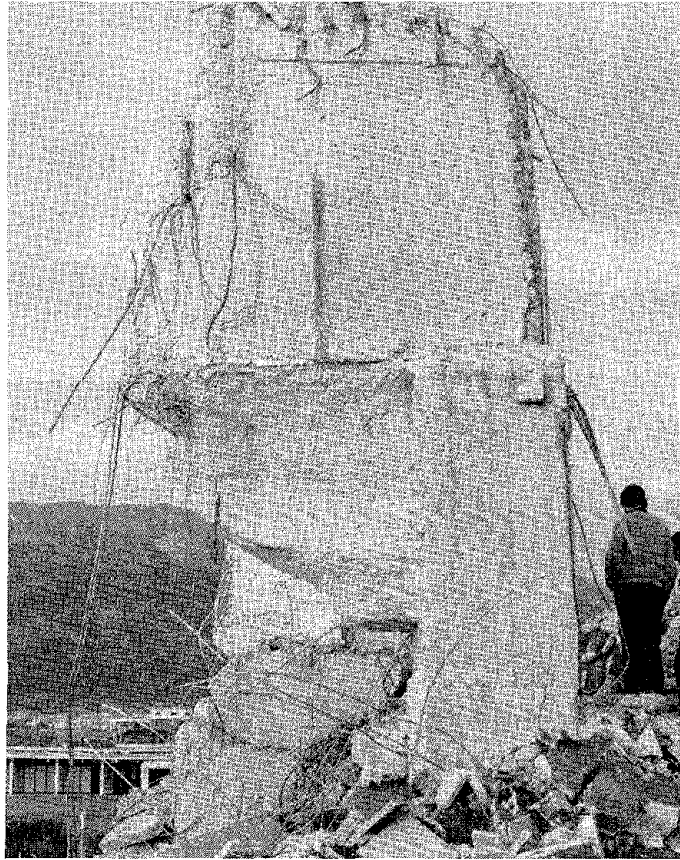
Apollo Hotel in Loutraki. Detail of the joint between shear wall and horizontal diaphragm. Note the slip of the horizontal reinforcing mesh wires of the slabs from the walls (arrows).
